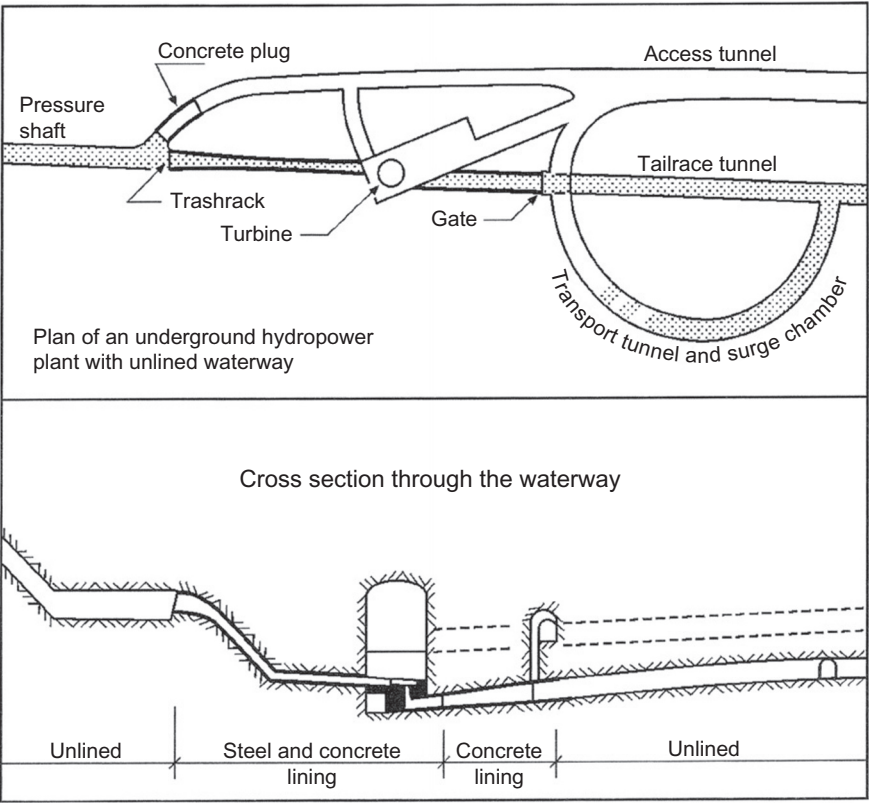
An underground hydropower plant—Typical layout of tunnel system [10].
